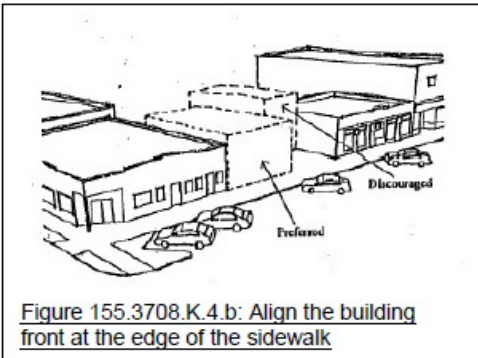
K.4.b: Align the building front at the edge of the sidewalk
